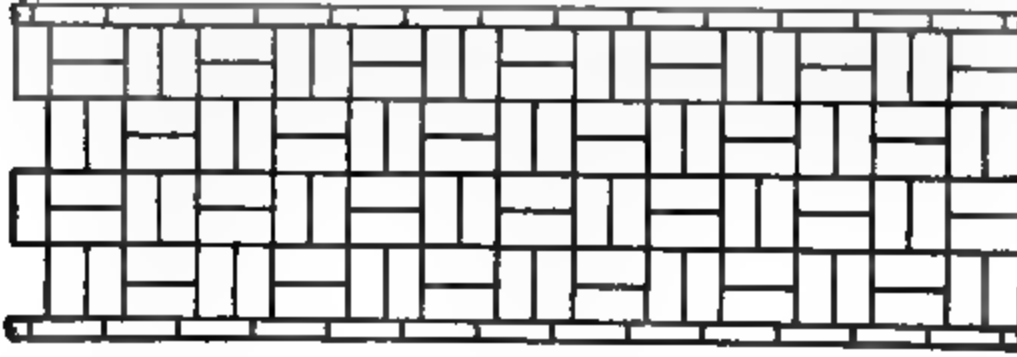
BLOCK-IN-COURSE BRICK SIDEWALK.
